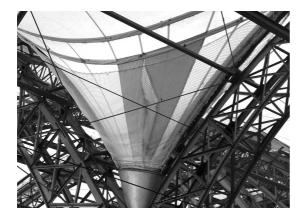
One of the damages in the Dresden railway station roofing (author)
